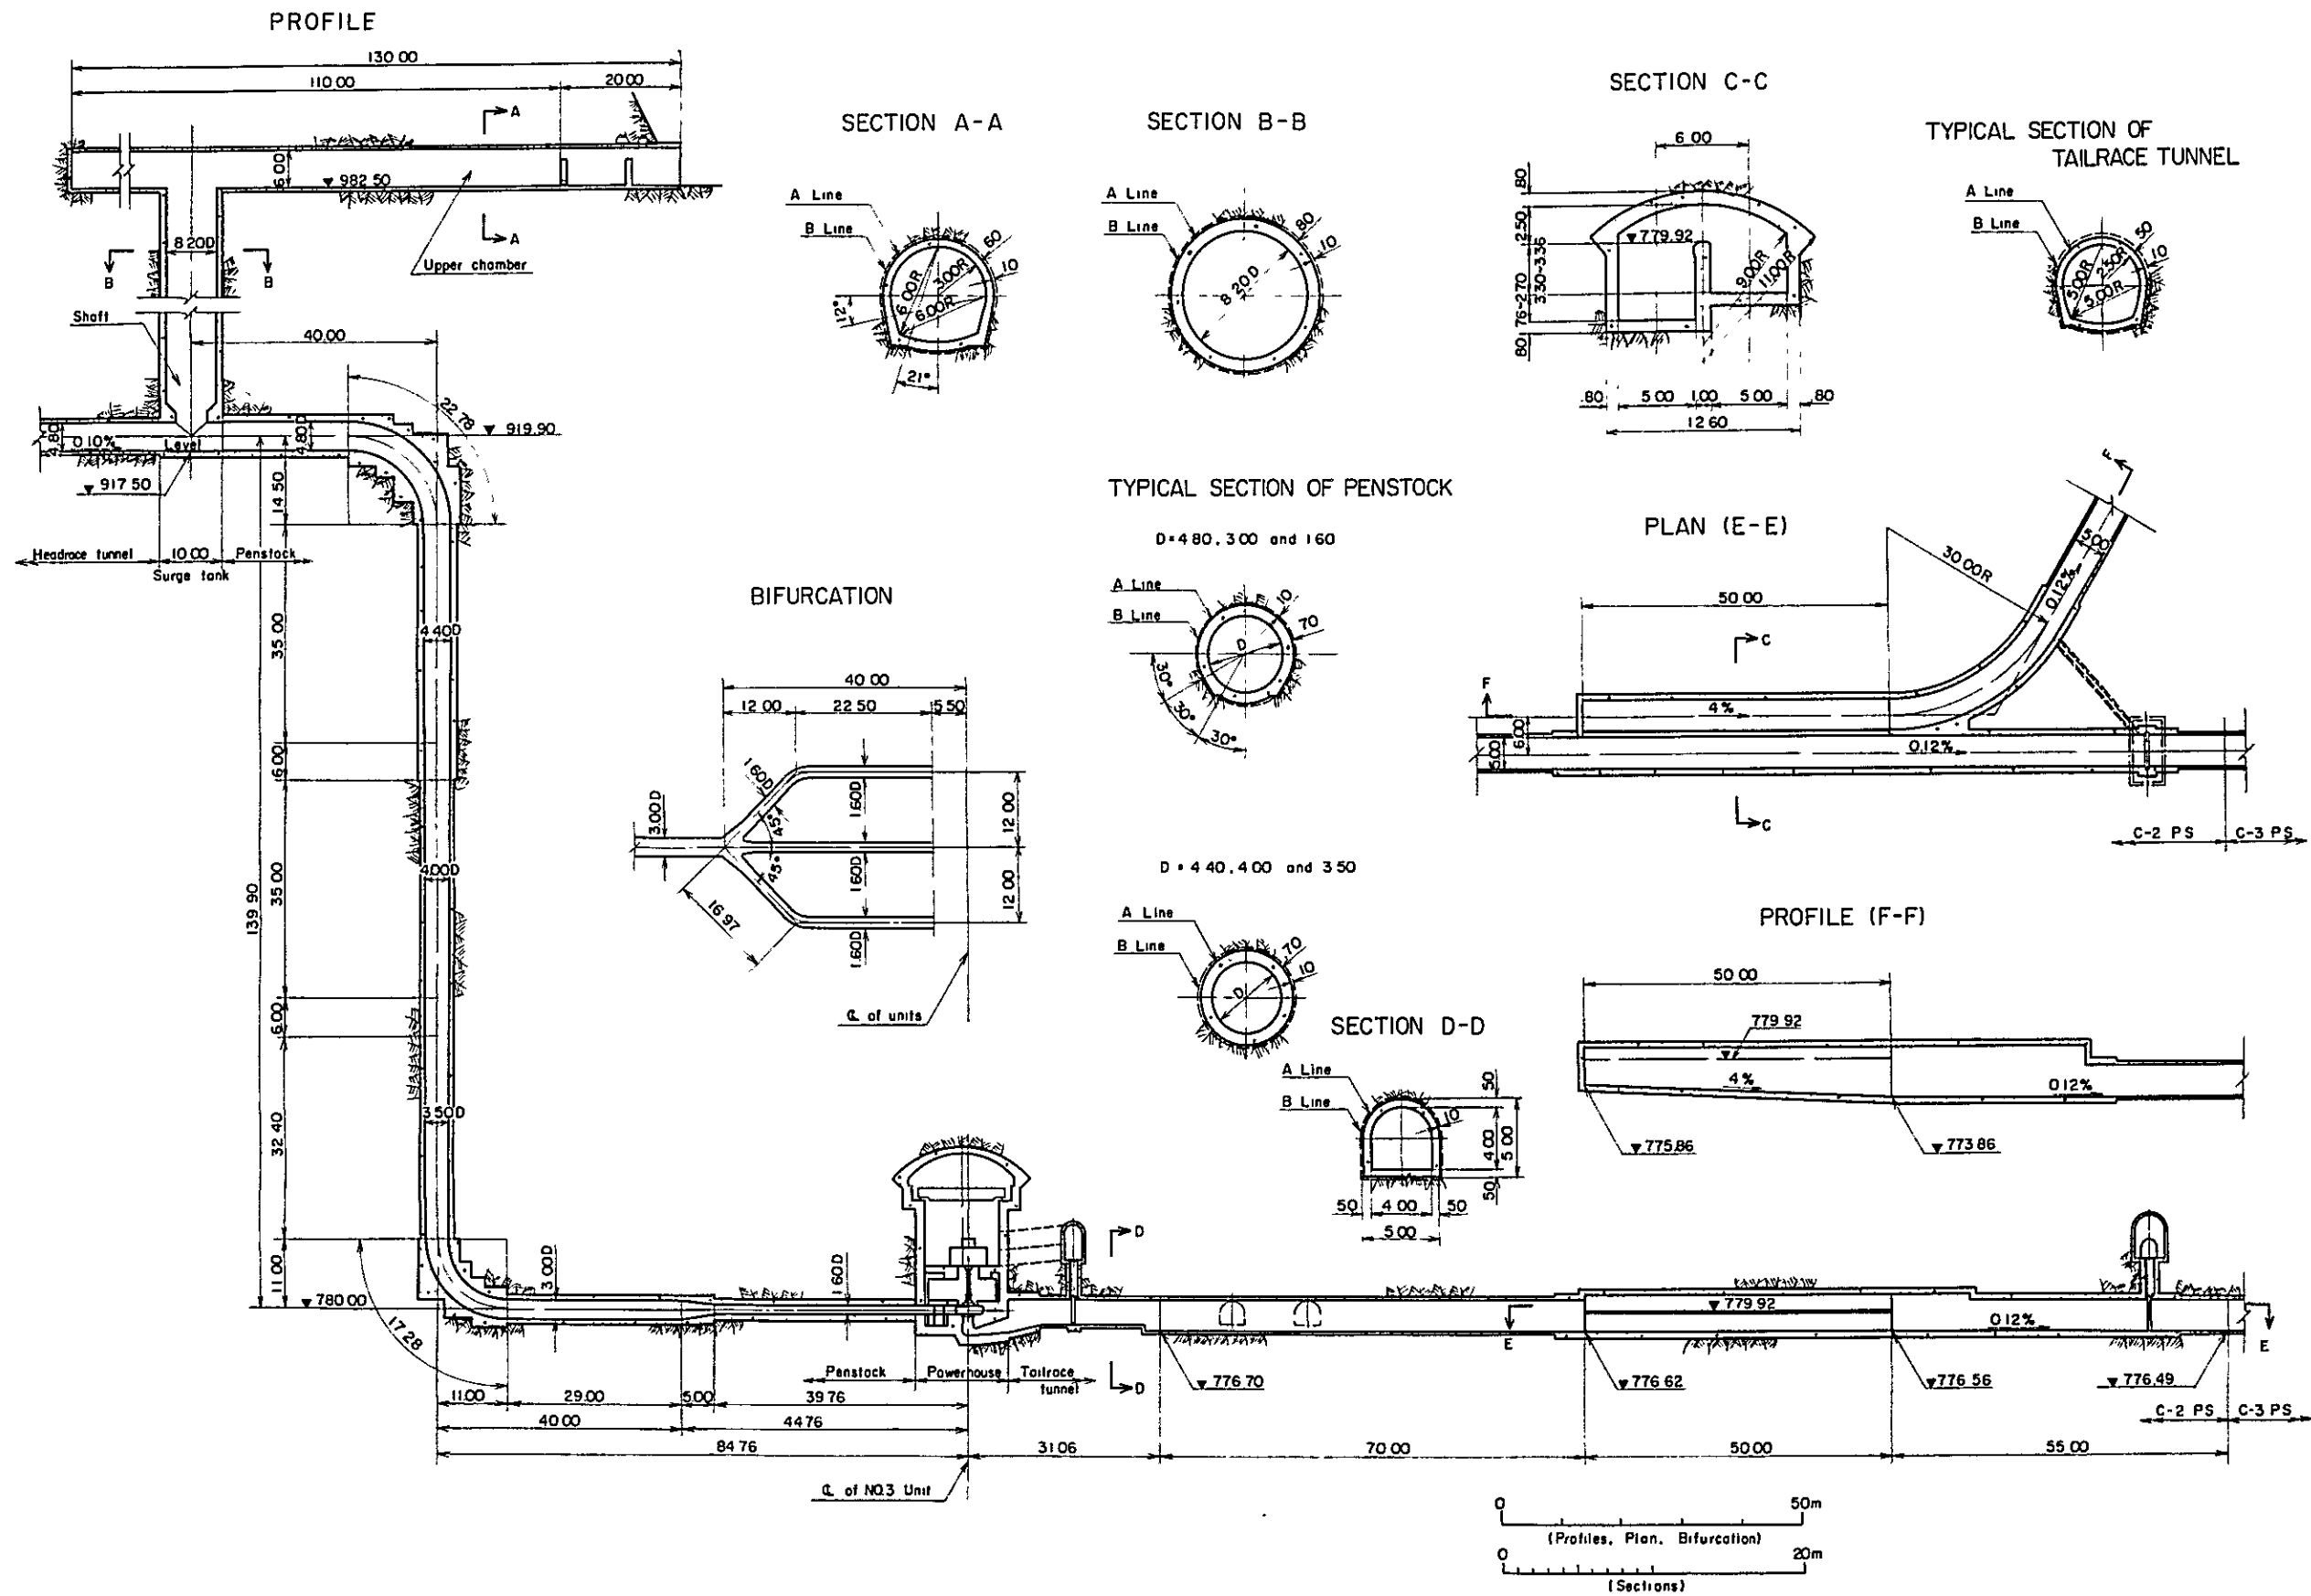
6 Surge Tank, Penstock, Powerhouse and Tailrace Tunnel (C-2), Profile and Section
